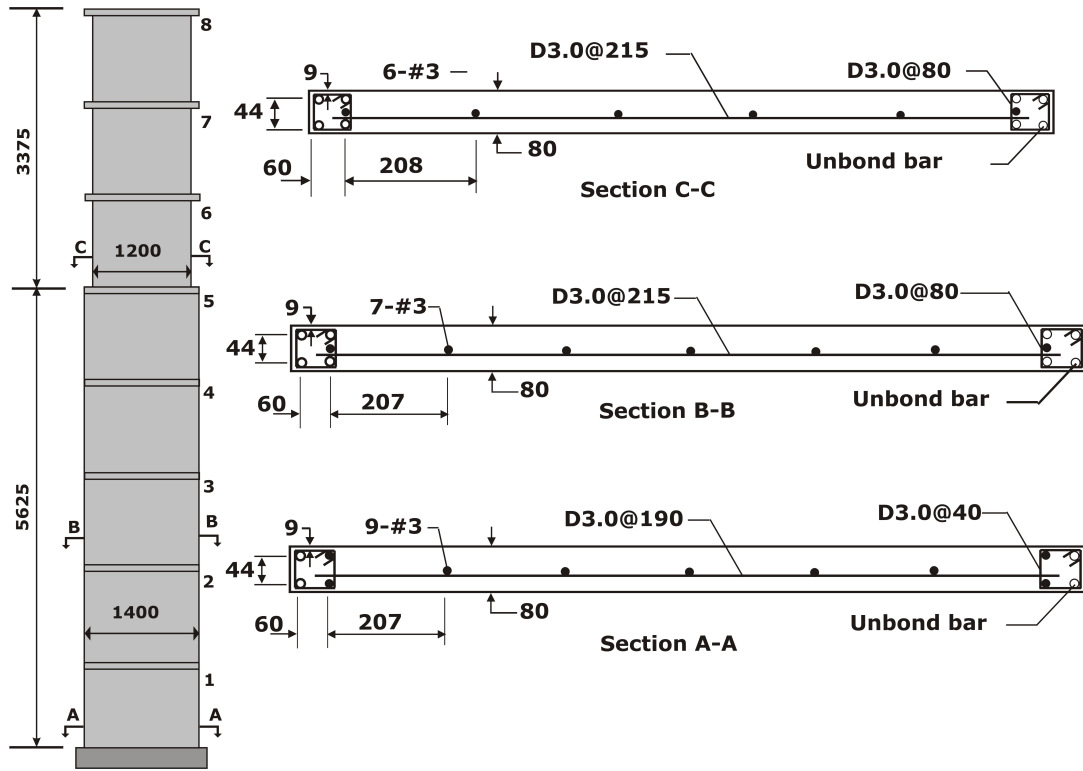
Model wall dimensions and steel reinforcement (dimensions are in mm).
